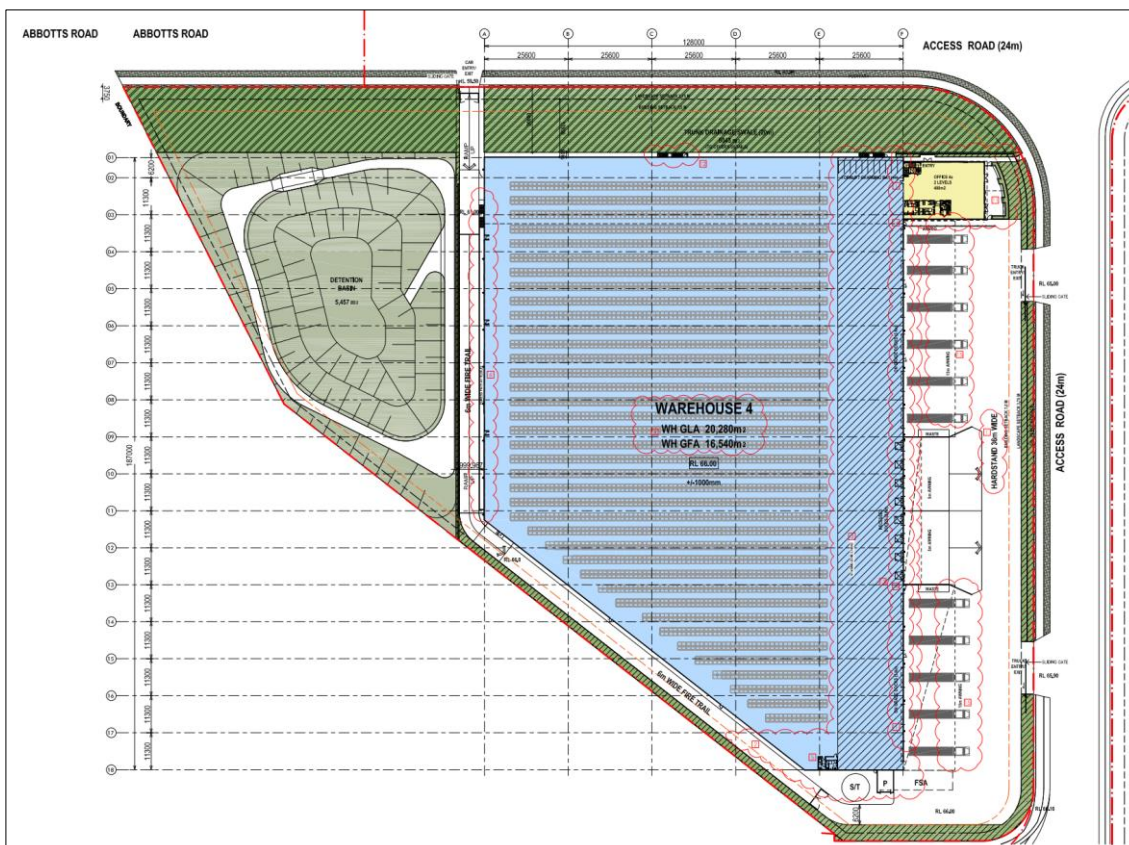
Approved Scheme Site Plan – Lot 3 (Previously Lot 4)
